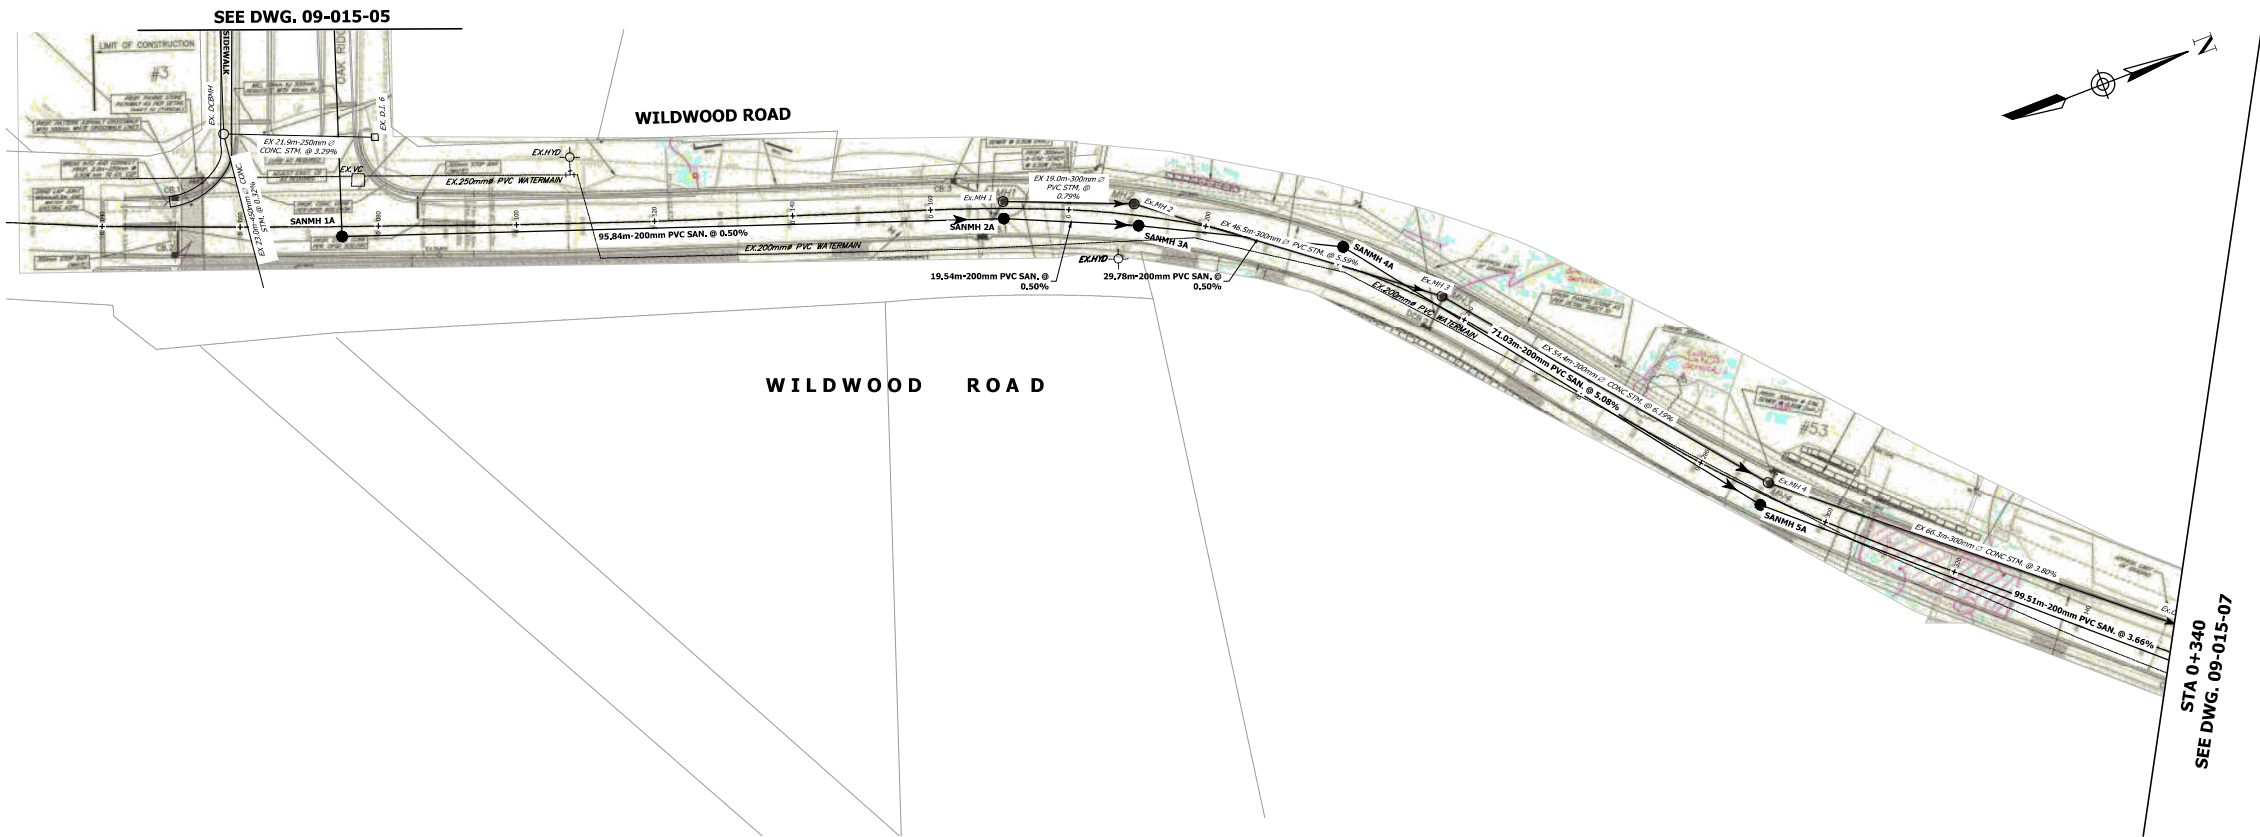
EXTERNAL SANITARY SEWER PLAN AND PROFILE
